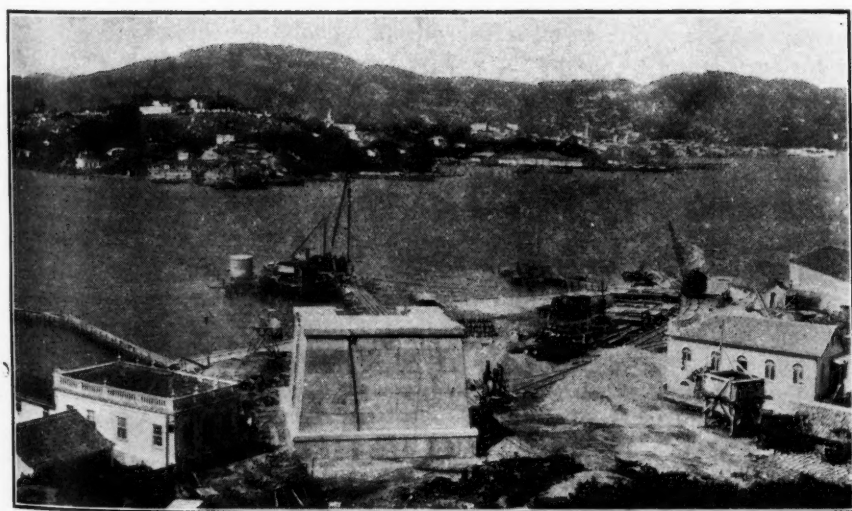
VIEW OF CROSSING DURING CONSTRUCTION OF MAIN PIERS, FLORIANOPOLIS BRIDGE.
